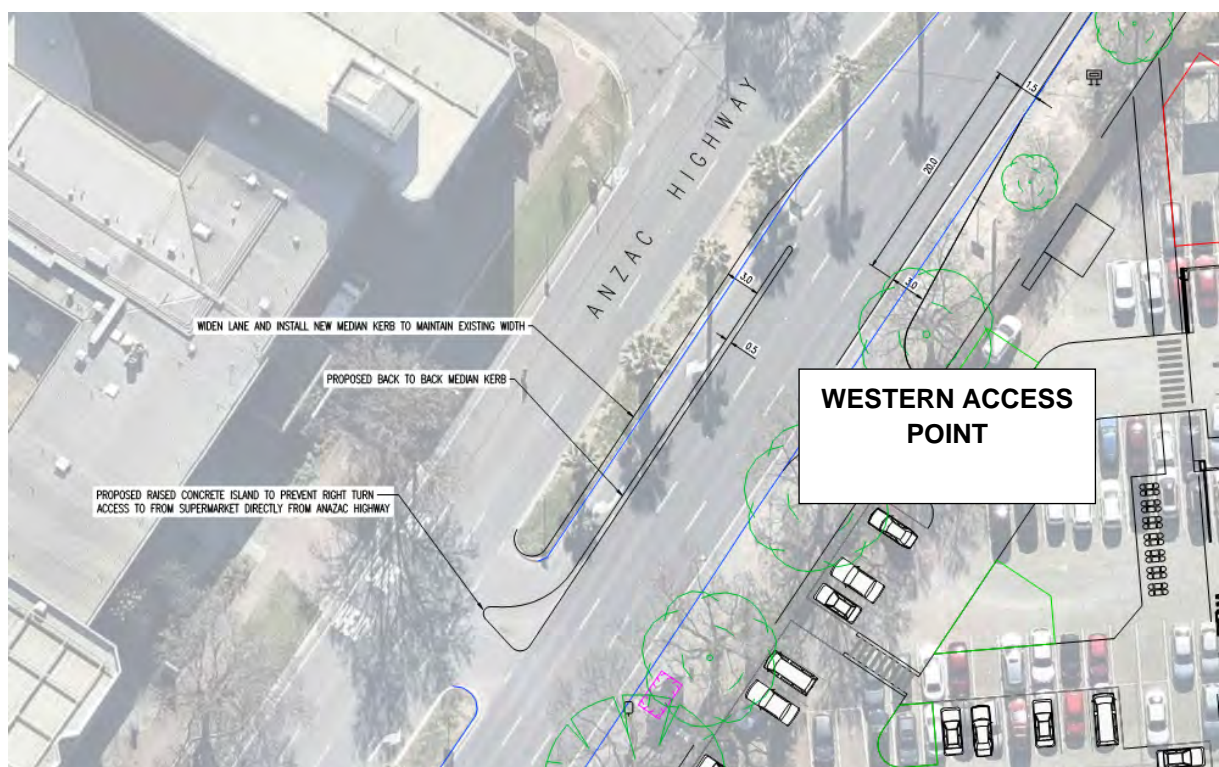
Proposed Modifications to Median adjacent Western Access Point
